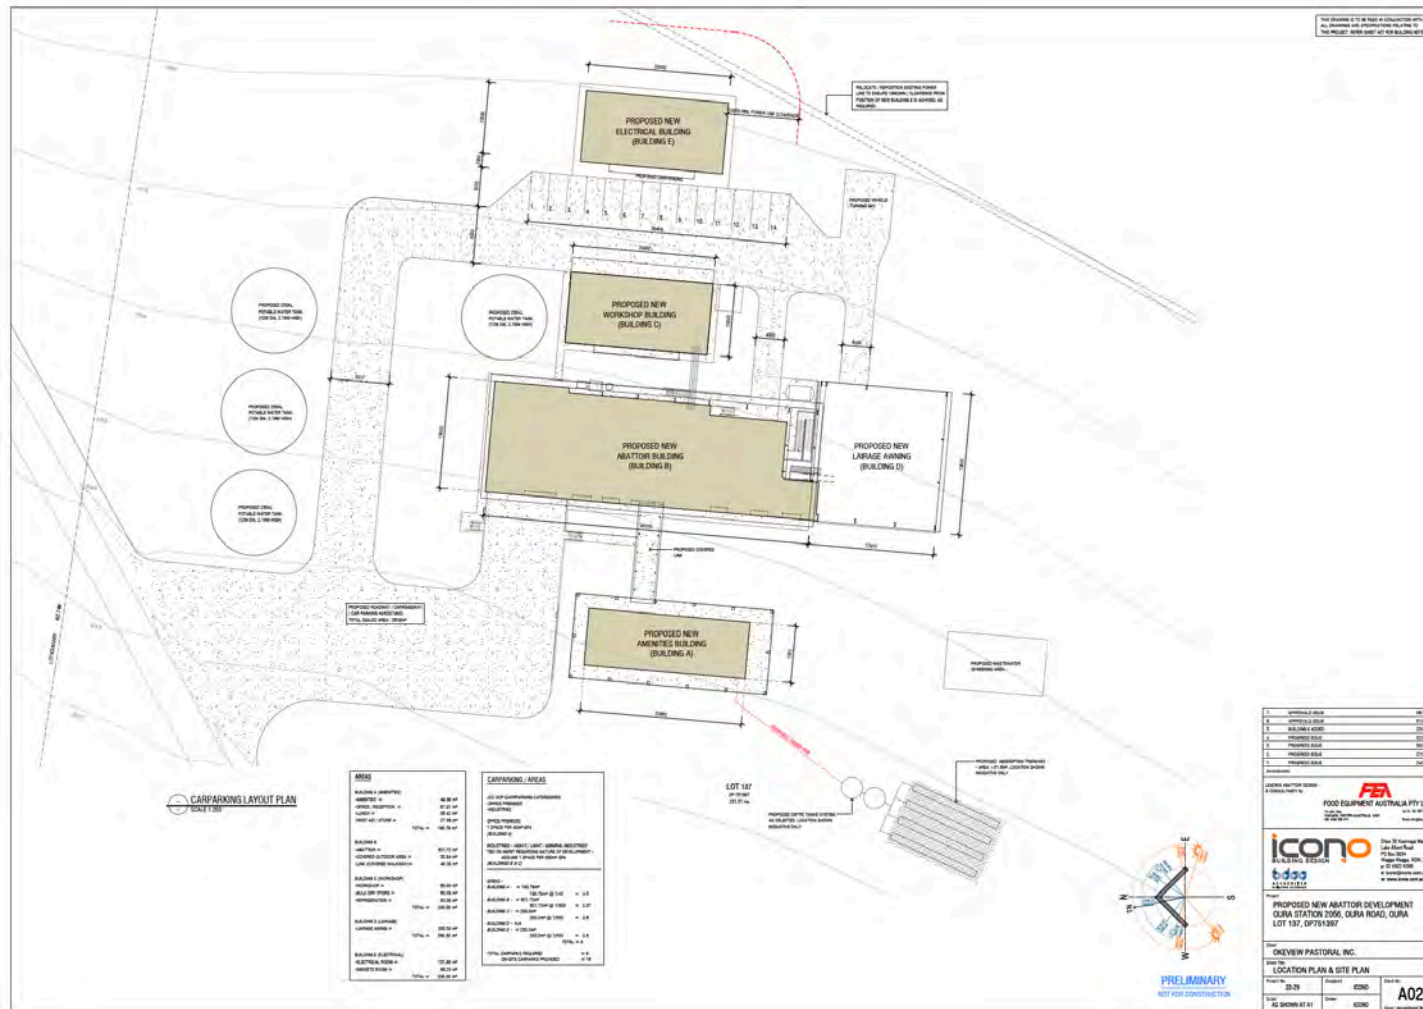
The Proposal Layout (source: Extract from the Applicant's architectural design plans)
